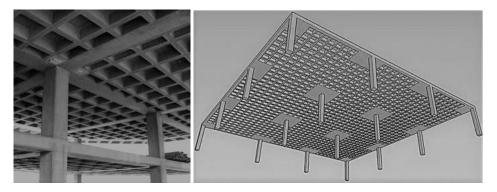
Common practice for Waffle Slab (also referred as Two-Way Joist Concrete Slab) Floor.^{1,2}
